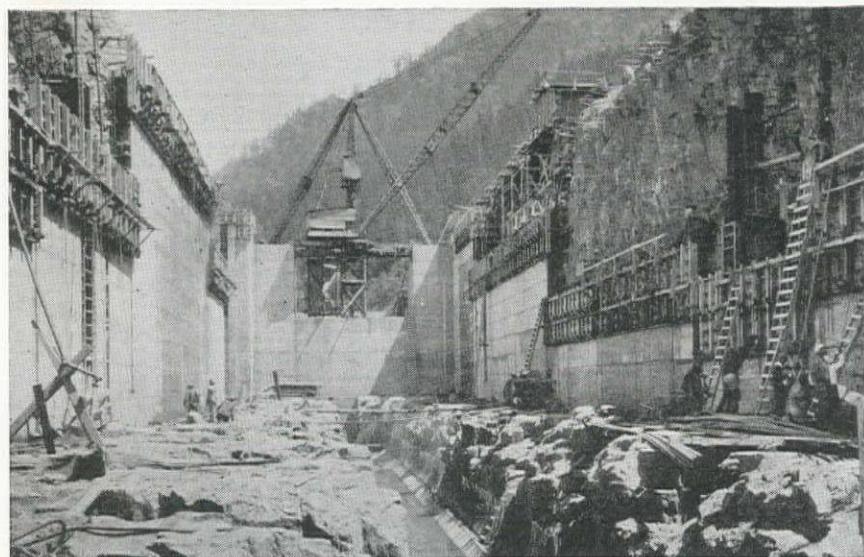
Ship lock, looking upstream with top concrete at Elevation 85, has foundations extending to a maximum depth of Elevation 80.
